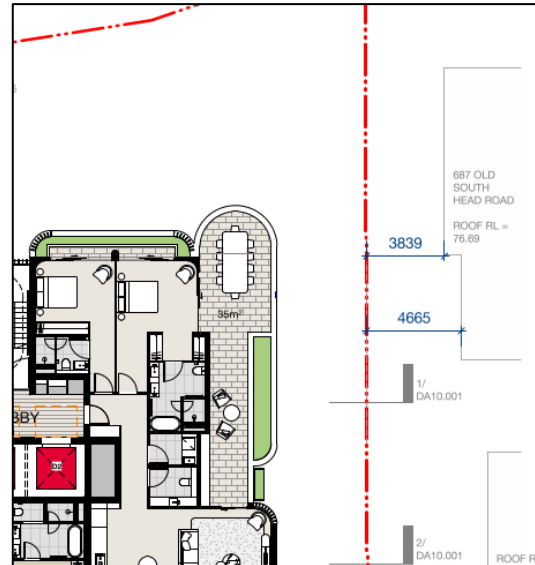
Extract of the plan (Level 2 of the northern building) adjoining 658-687 Old South Head Road to the north of the site
